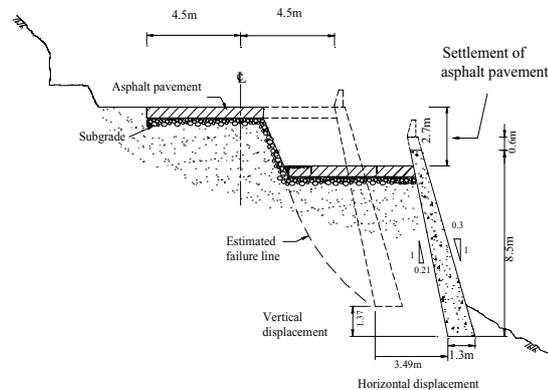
(b). Cross section of the damaged soil retaining wall situated on slope.
